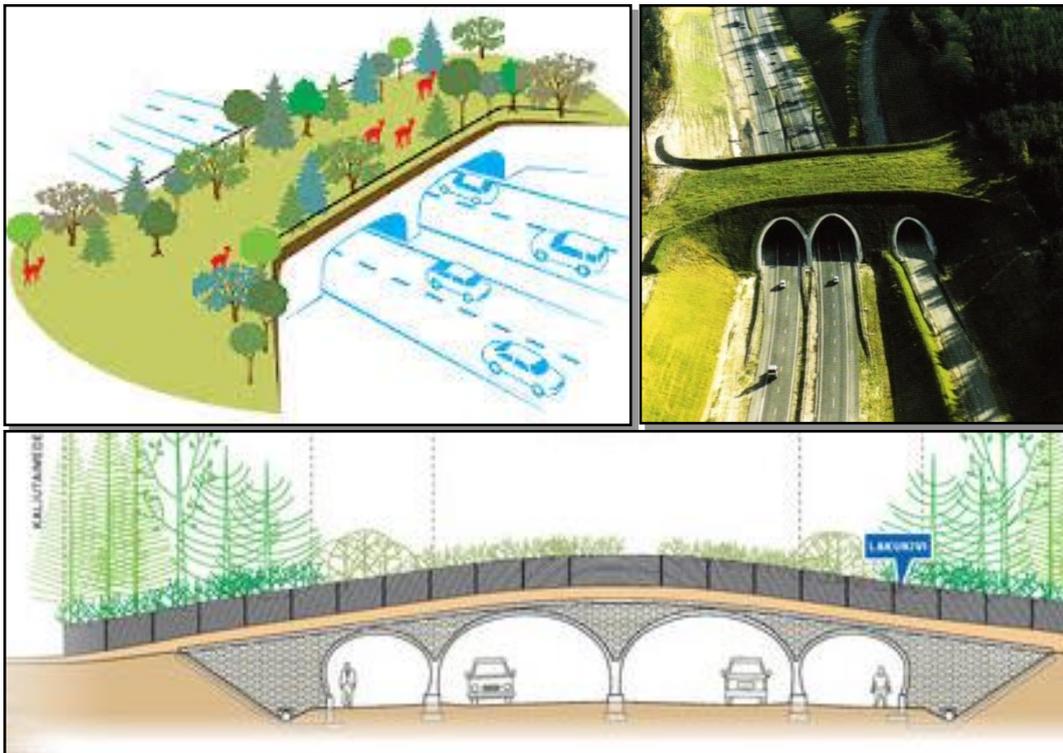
An example of a land bridges or eco-duct overpass land bridge
